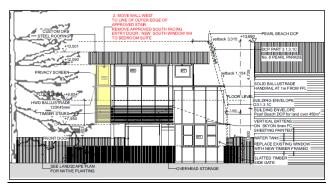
South Elevation (street frontage) approved as a result of Condition 2.6a imposed by the Panel and modification Part A
